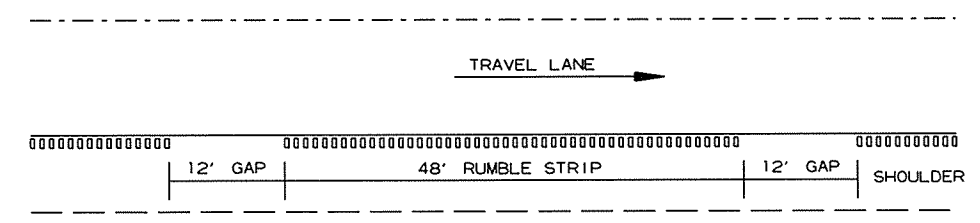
DETAIL FOR RUMBLE STRIP GAP AT DRIVEWAY TURNOUTS
